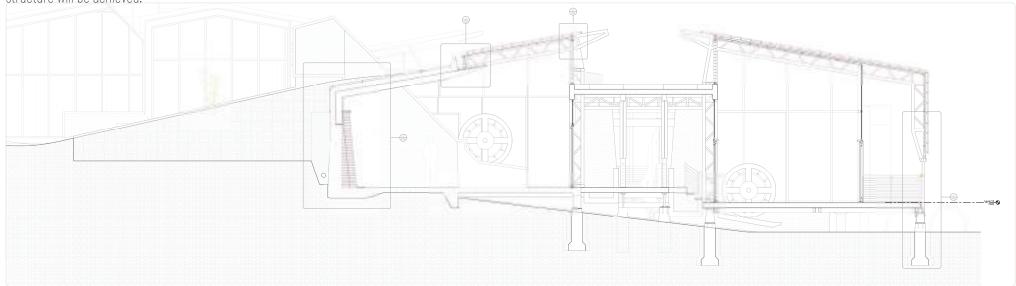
Detail Section Callout: 01 (Author, 2019)
